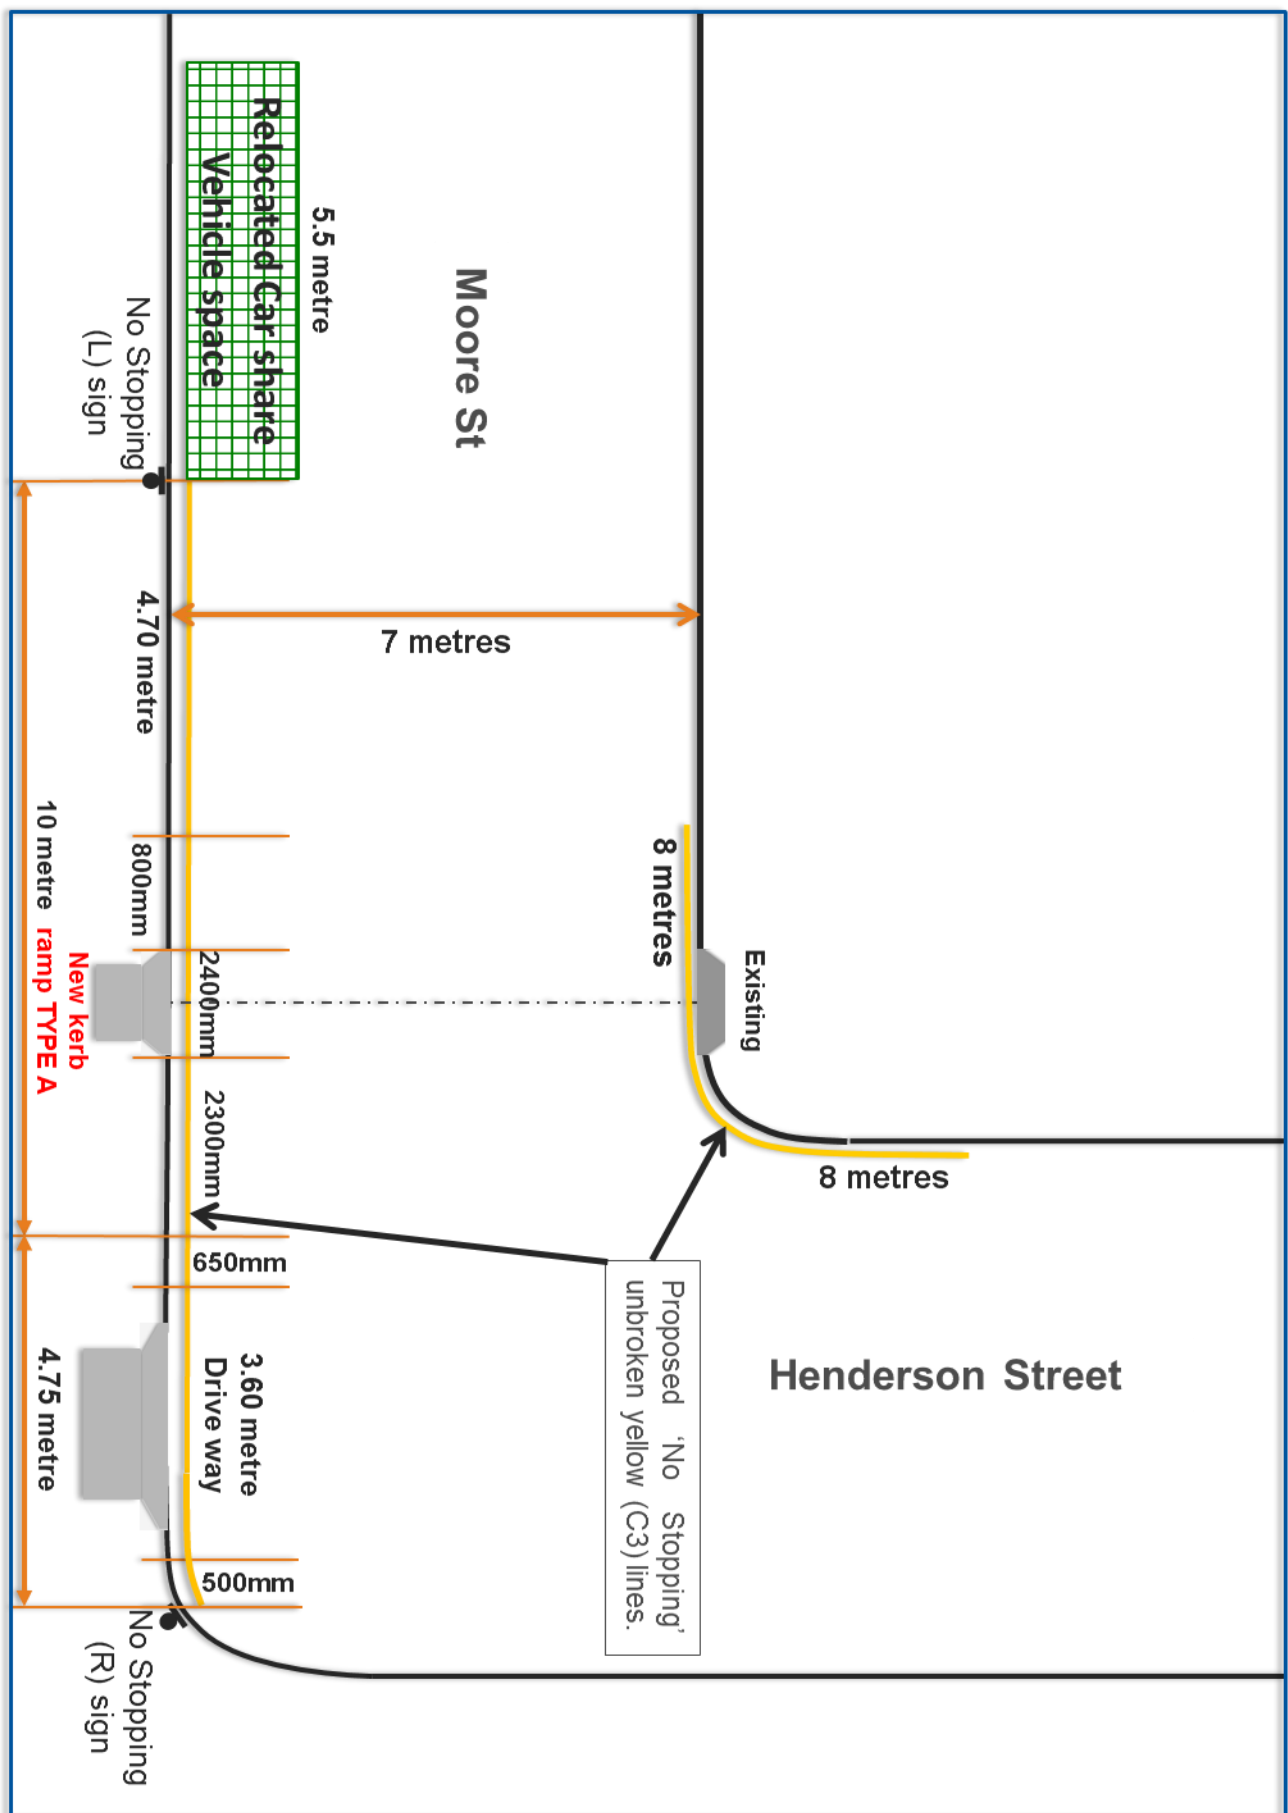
Details of changes on Henderson Street/Moore Street, Bondi.
